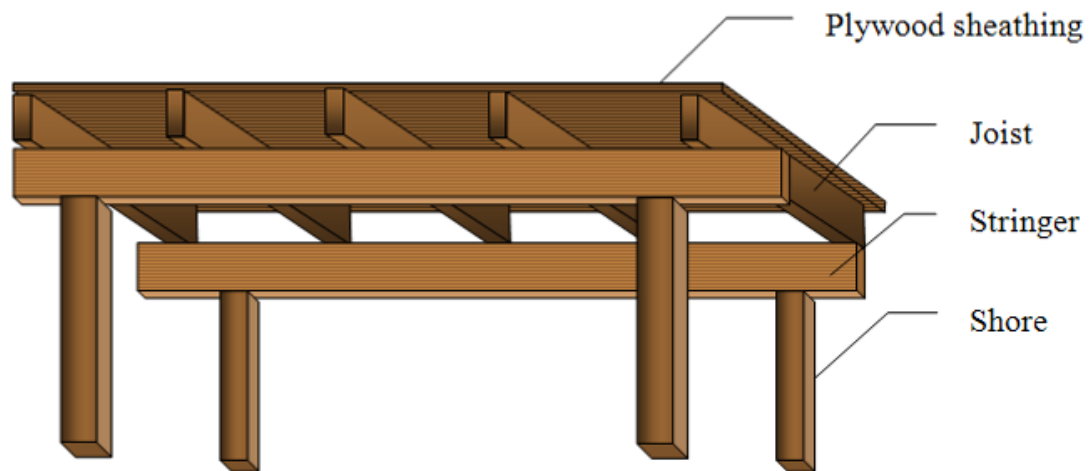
Conventional wooden shored formwork layout for deck (after [76])
